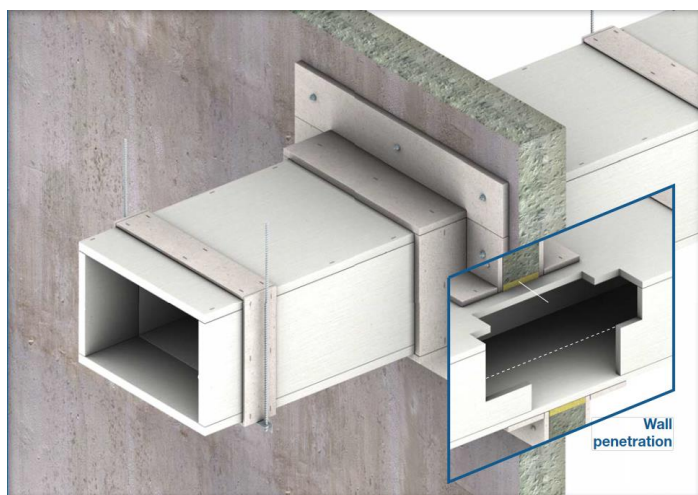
3D schematic of self-supported duct system made of PROMASIL®1100 Super boards
